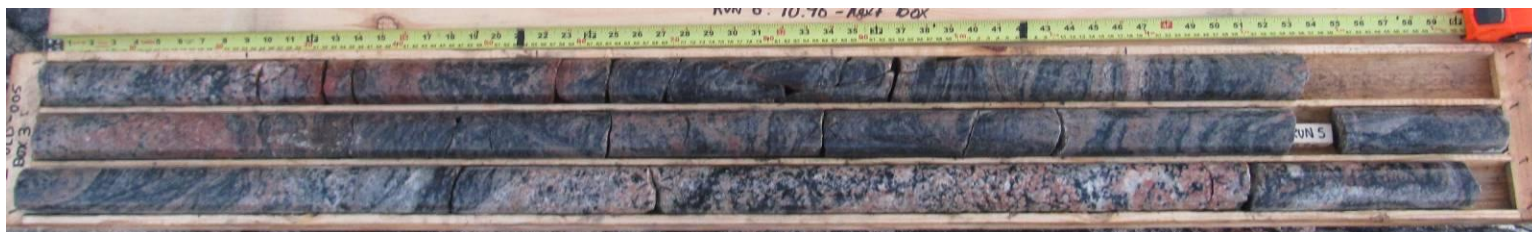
Core Box #3 of 8 (Runs 4-5, 8.4m – 12.6m)
